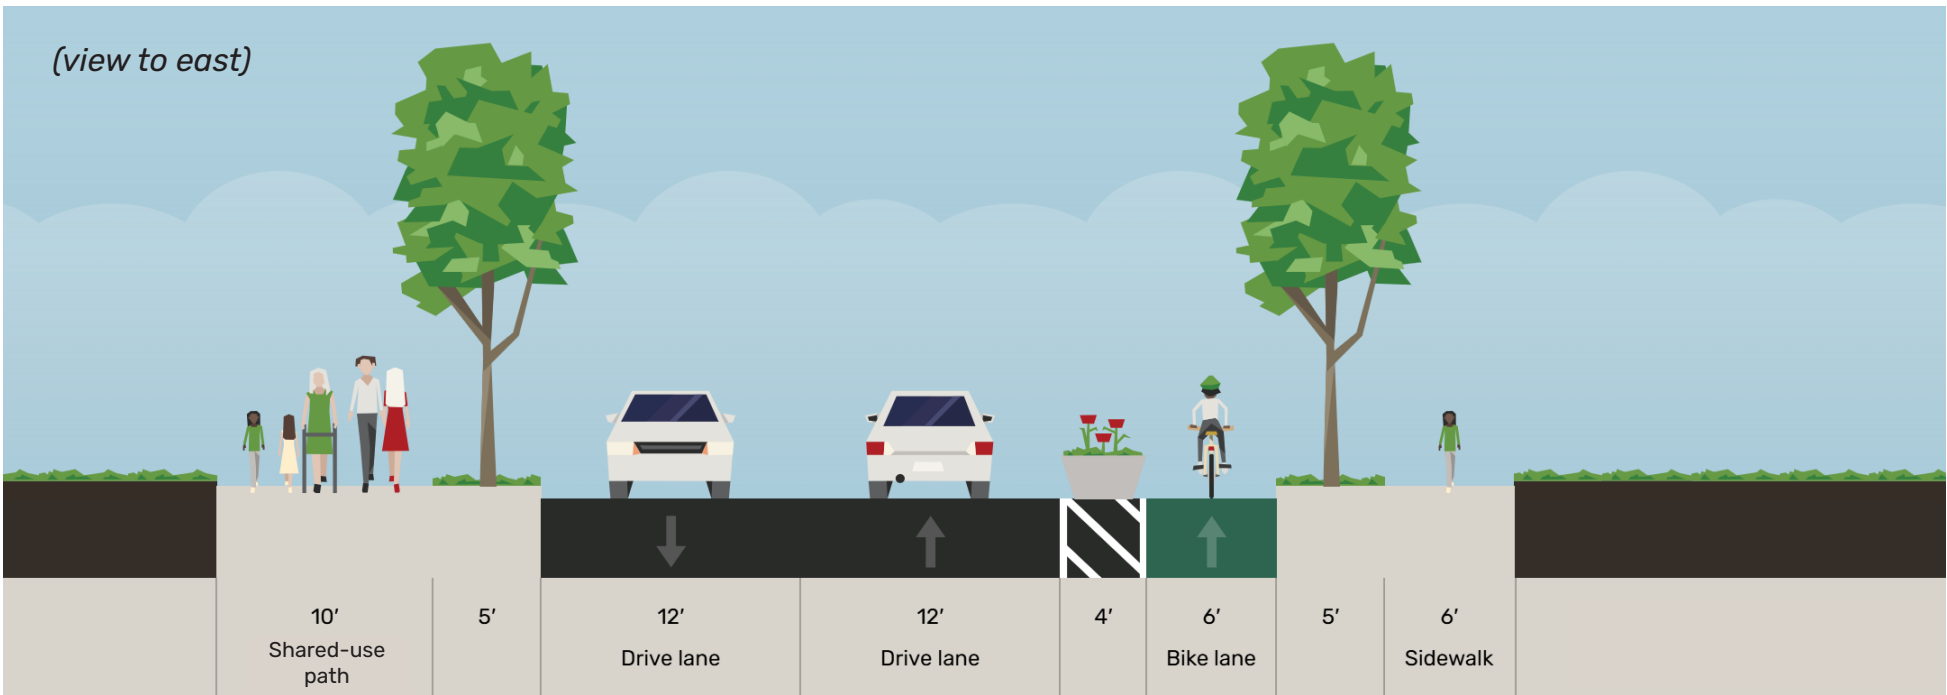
Proposed Typical Cross-Section on Shady Shores Road (60’ ROW)
